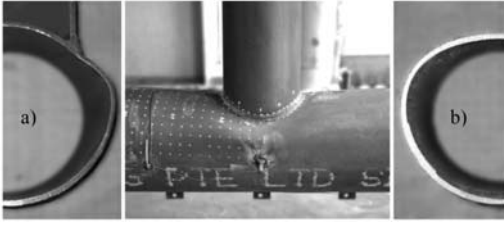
Failure mode of the joint BC.T.069.ISO a) cross-section at center and b) 200 mm from crown.
